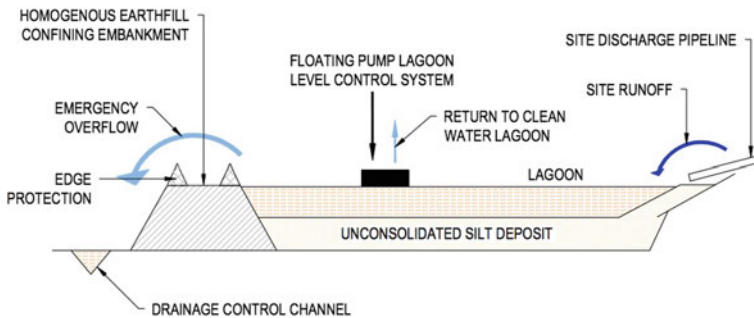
Typical section through a silt or ash lagoon (Cambridge 2012a, b)
